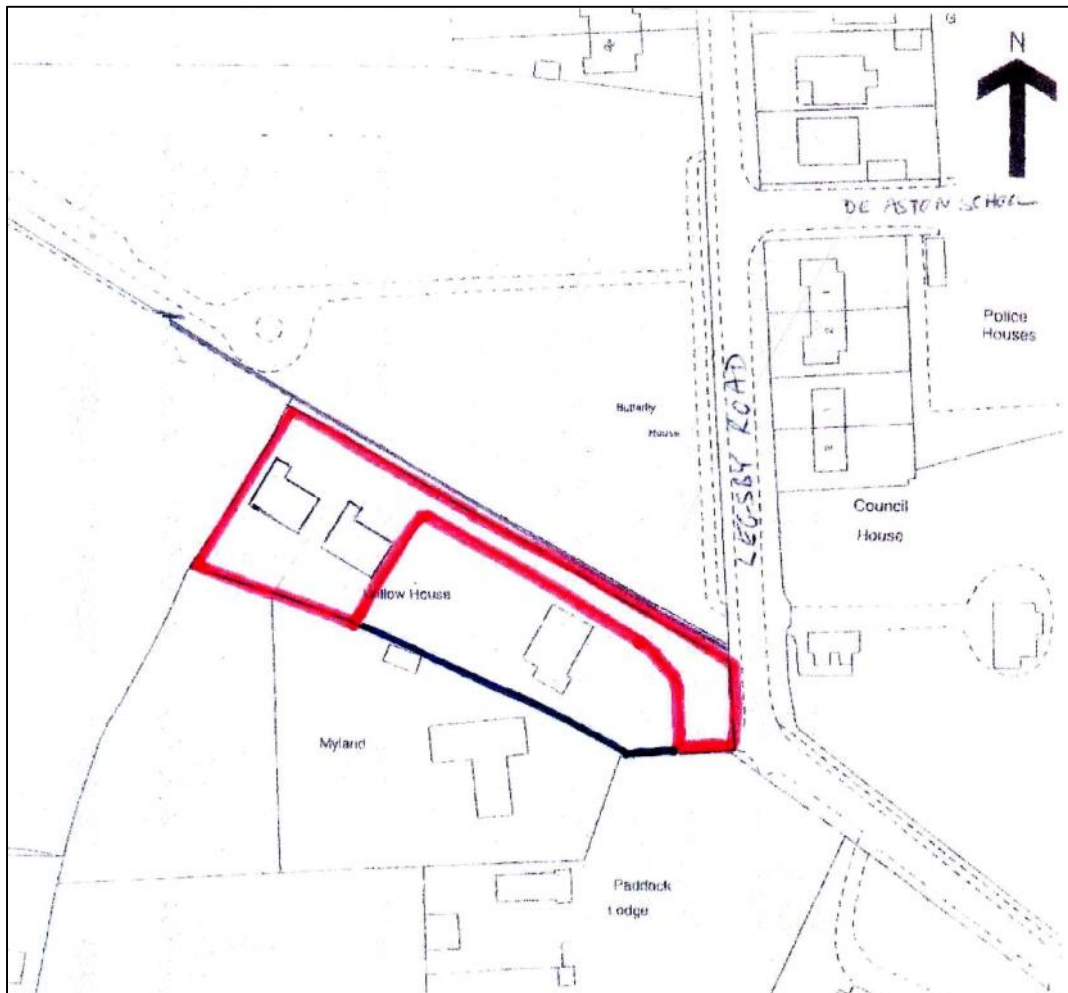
Location plan of the site at scale 1:1250. Plan supplied by client.
